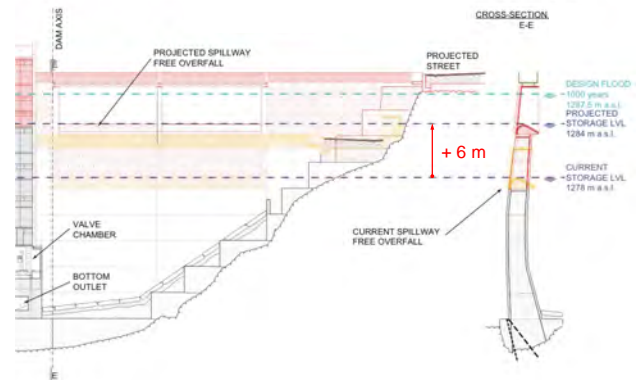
Downstream view of the proposed dam heightening (left) and cross-section (right) (drawings modified from Lombardi SA)
